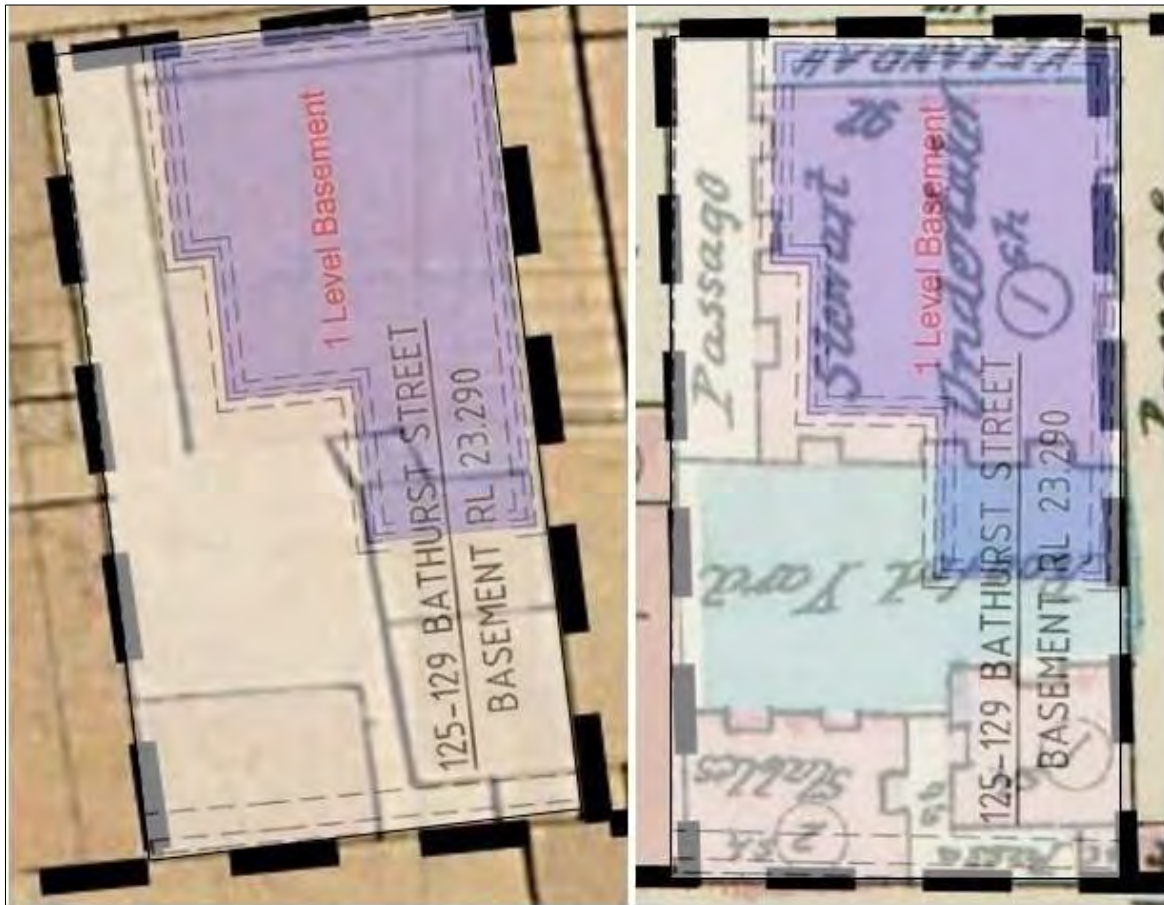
Detail from the 1865 Trigonometric Survey of Sydney (left) and Percy Dove’s 1880 Plan. The footprint of the basement surveyed are shown.
